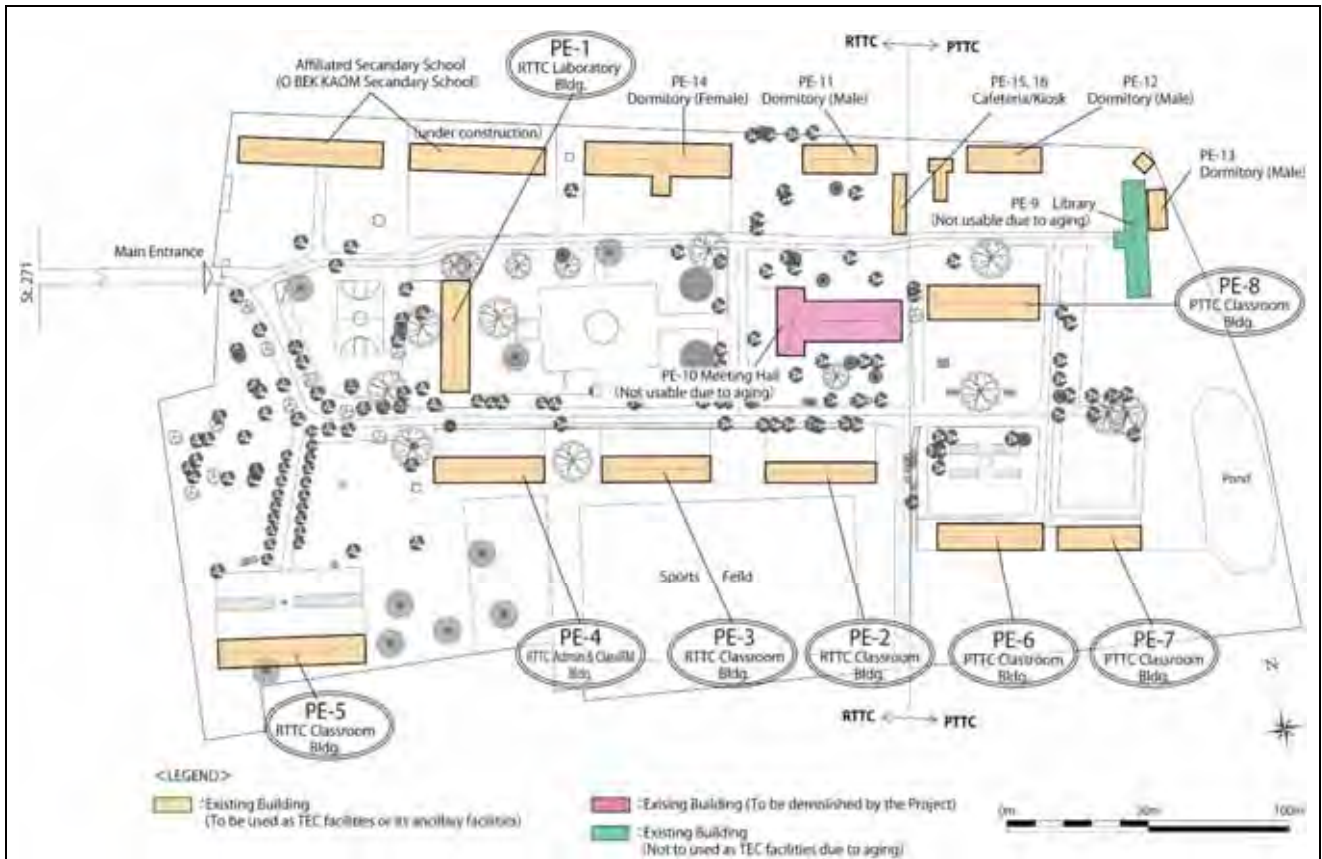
Current Site Layout of Phnom Penh PTTC/RTTC
